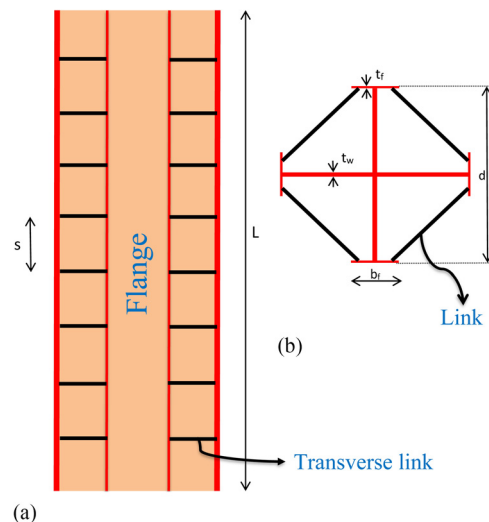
Geometry of a PEC column on the (a) steel-side elevation and on the (b) plan view
